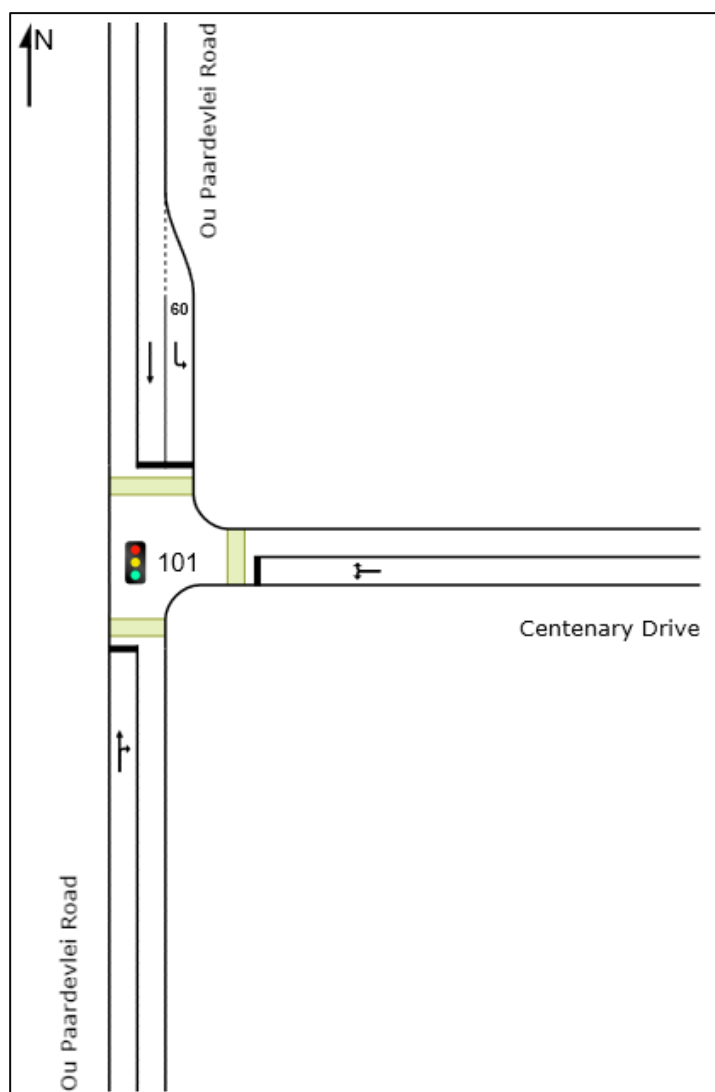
Proposed upgrade at the Ou Paardevlei Road / Centenary Drive Intersection
